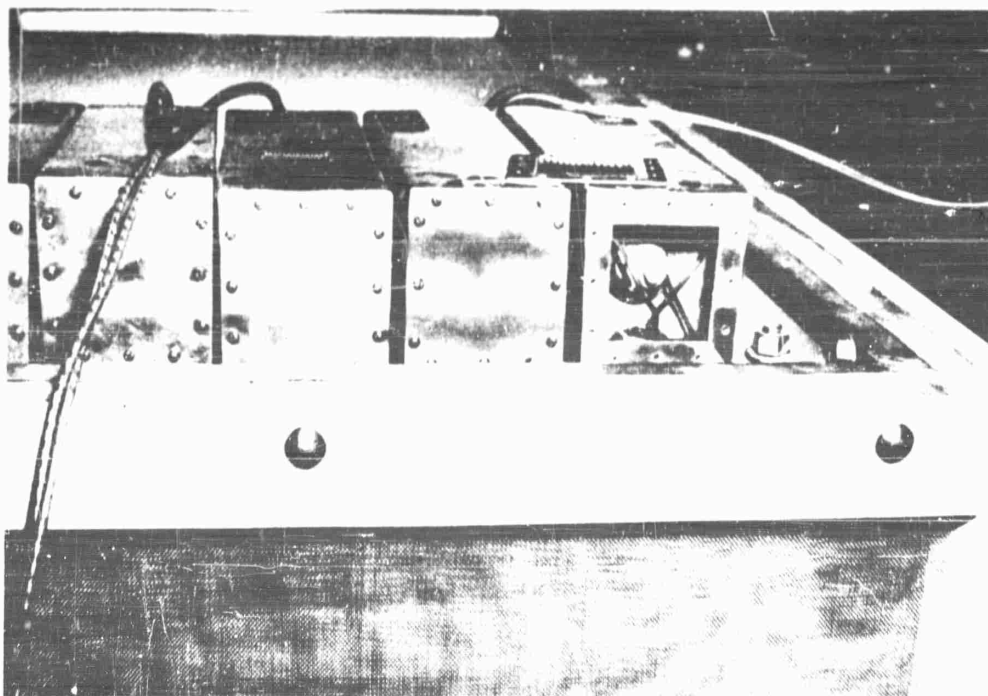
Exterior View of Ceiling Panel Showing Filter Installation
